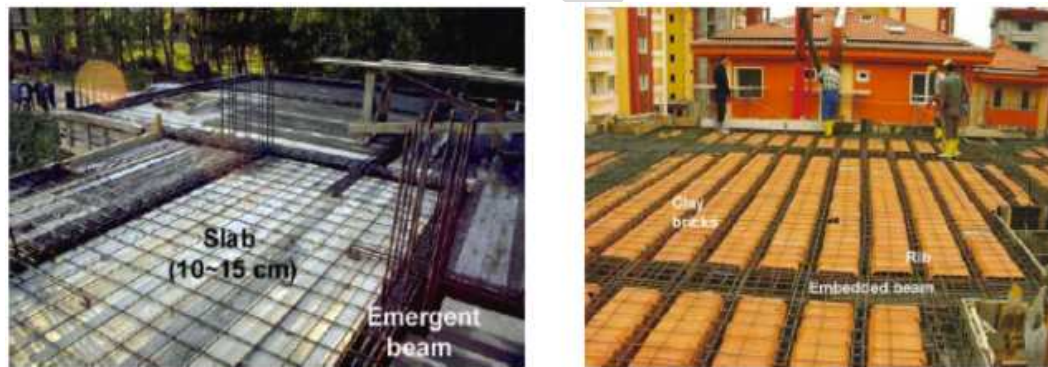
Construction application of emergent beam (left) and embedded beam (right)[Bal et al., 2010].
